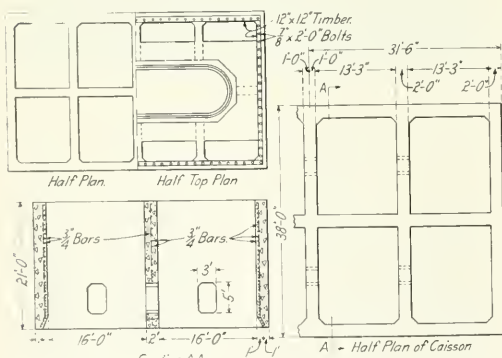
Large Caisson Used for Pier 8 of the Metropolis Bridge
